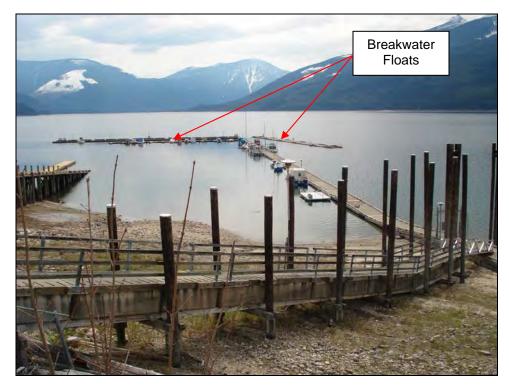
View of the western side of the existing Nakusp boat launch ramp looking south-east.
